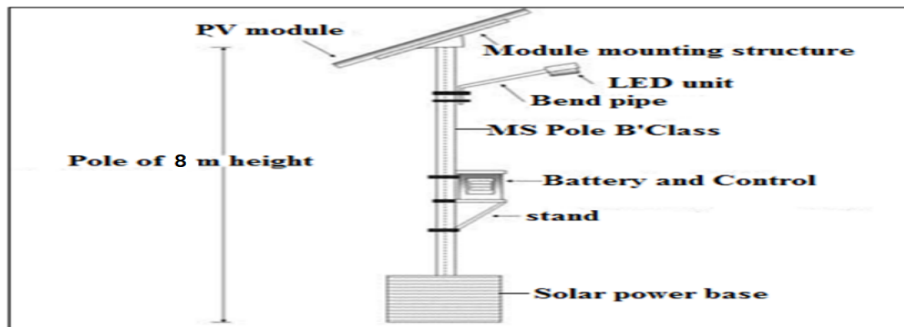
Shows pole mounted installation of solar based streetlight system
